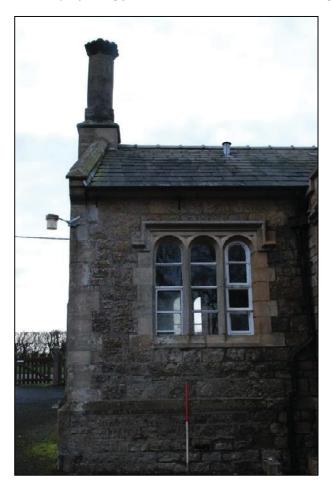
(shot 111): Only section of the northeast-facing elevation of the second classroom that is visible, looking southwest, scale 1m
